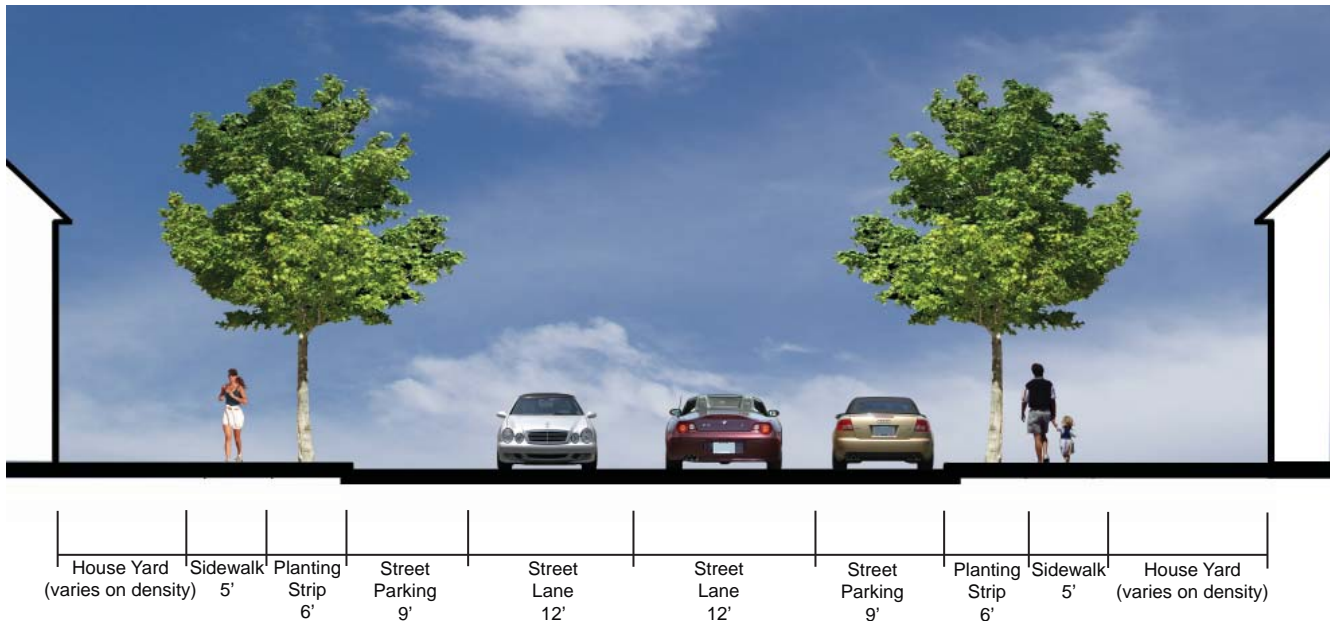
Street section. Section through residential and campus street. Amy Shaffer.
